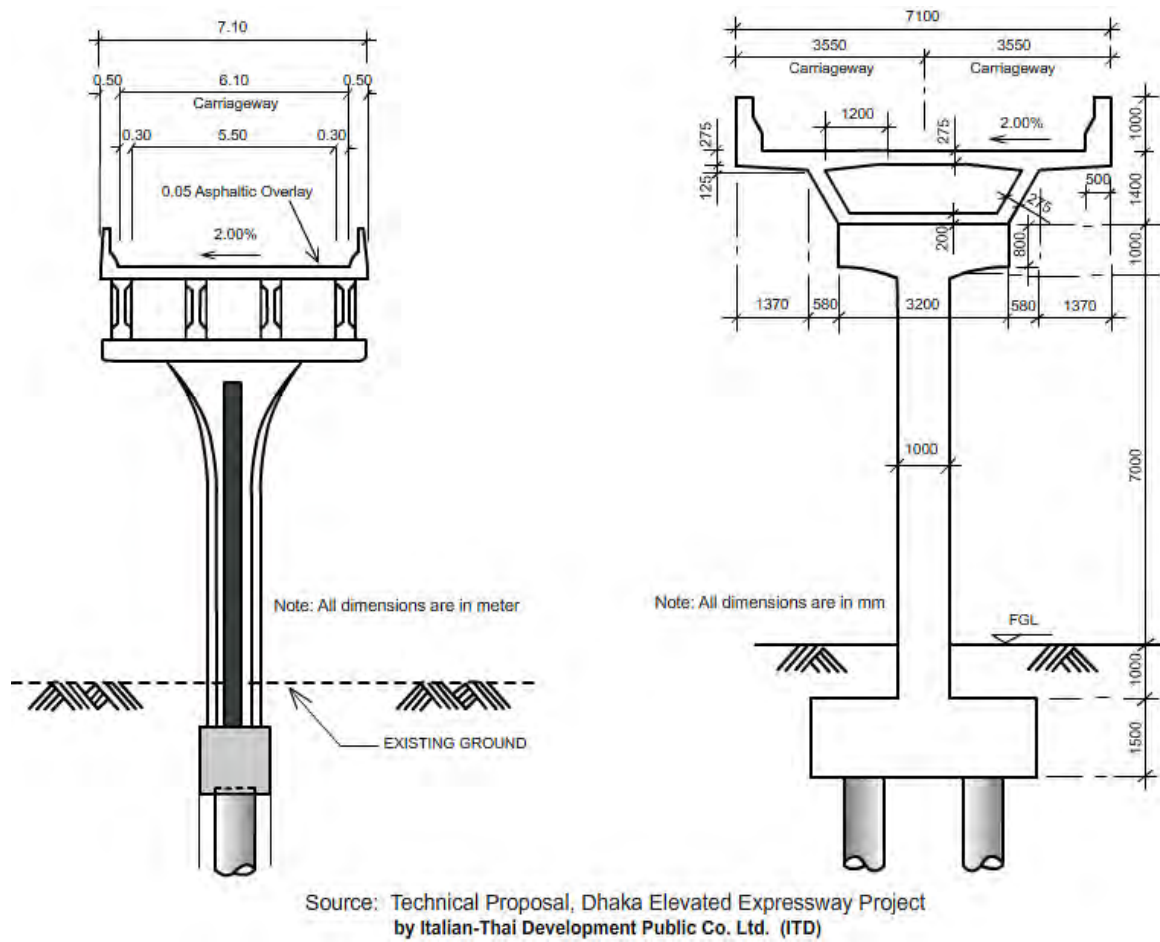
Ramps – I-Girder and Box-Girder Systems
